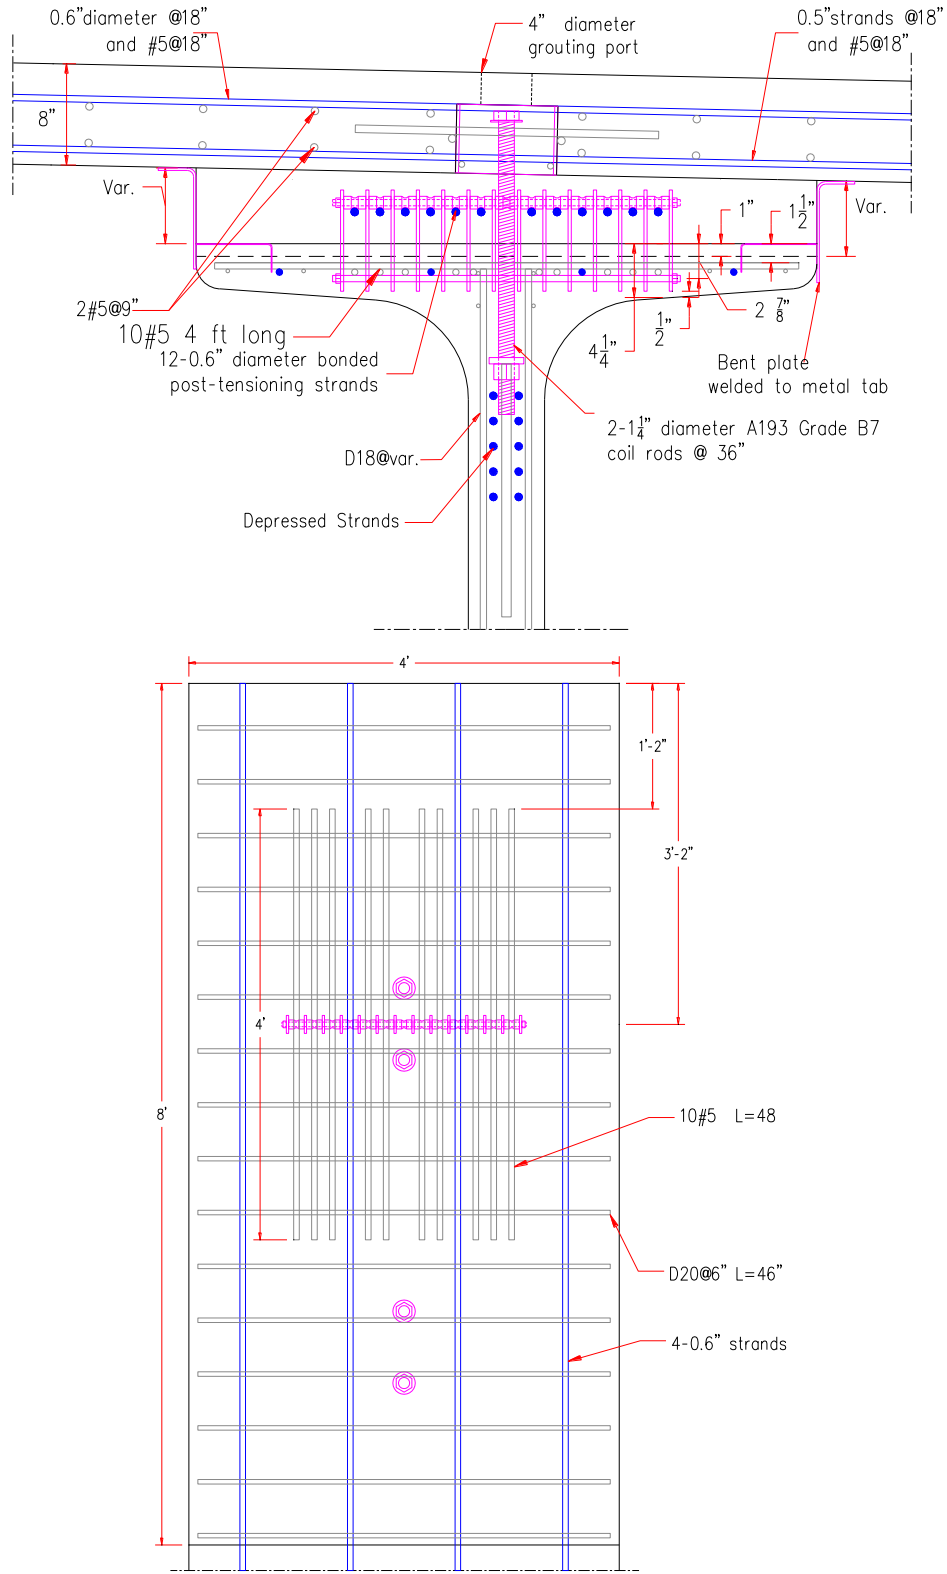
Cross section and plan views of the proposed deviator anchorage
